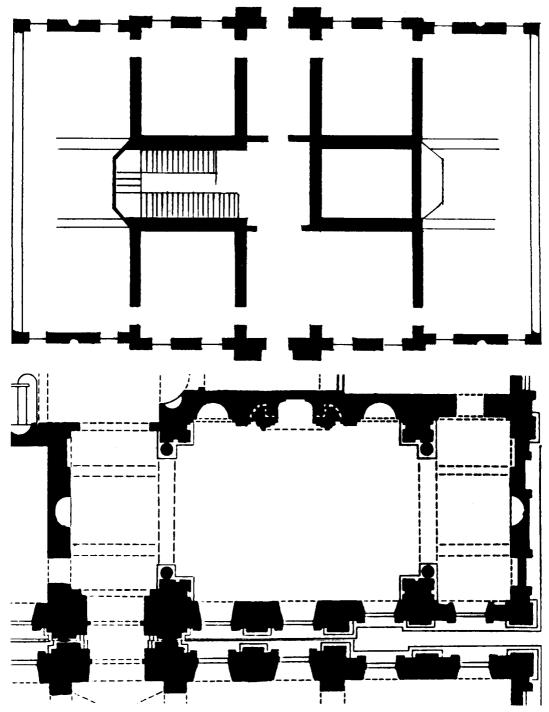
Reconstructed plan of the design shown in Fig. 9
